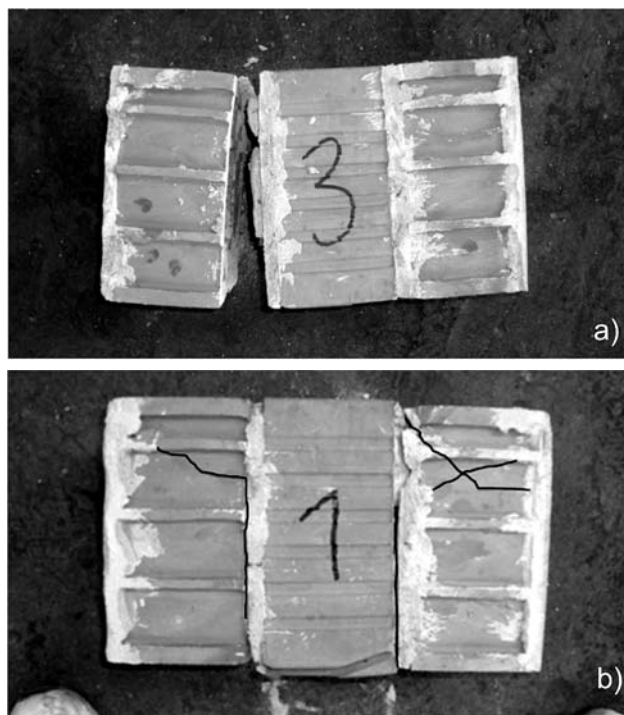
a) regular and b) irregular failure of test specimen (masonry unit on the right)
